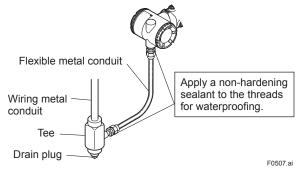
Typical Wiring Using Flexible Metal Conduit
